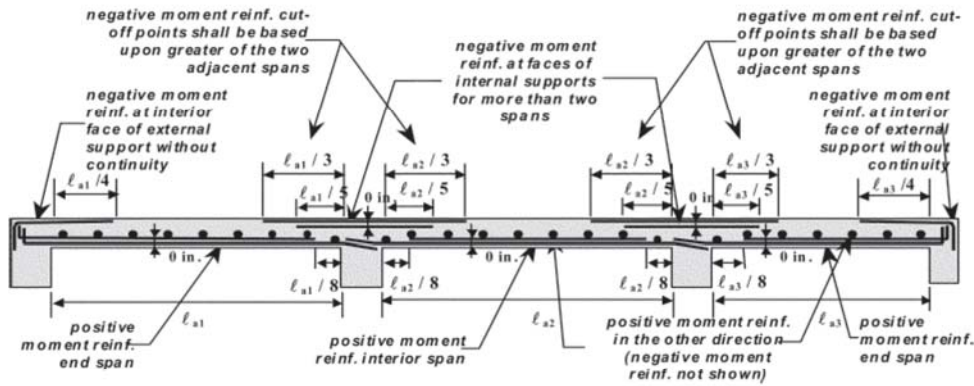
Reinforcement for two-way slabs supported by girders, beams, or reinforced concrete walls.
